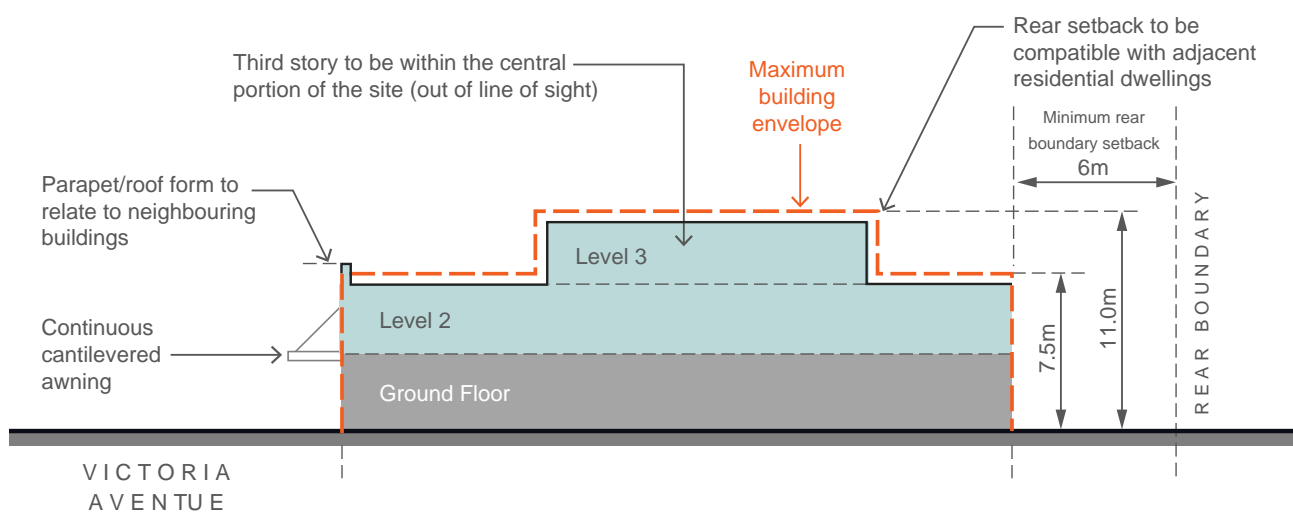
Victoria Avenue Shopping Centre - Maximum Building Envelope Section
